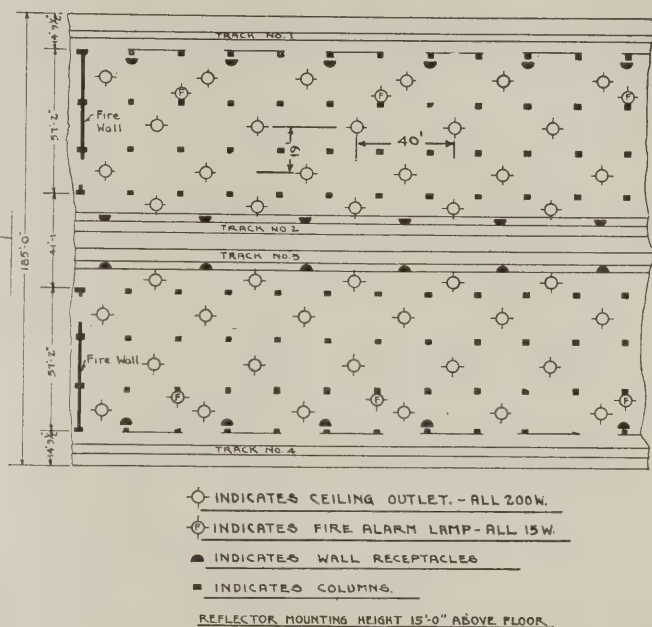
Section of Modern Pier Showing Location of Lighting Outlets
